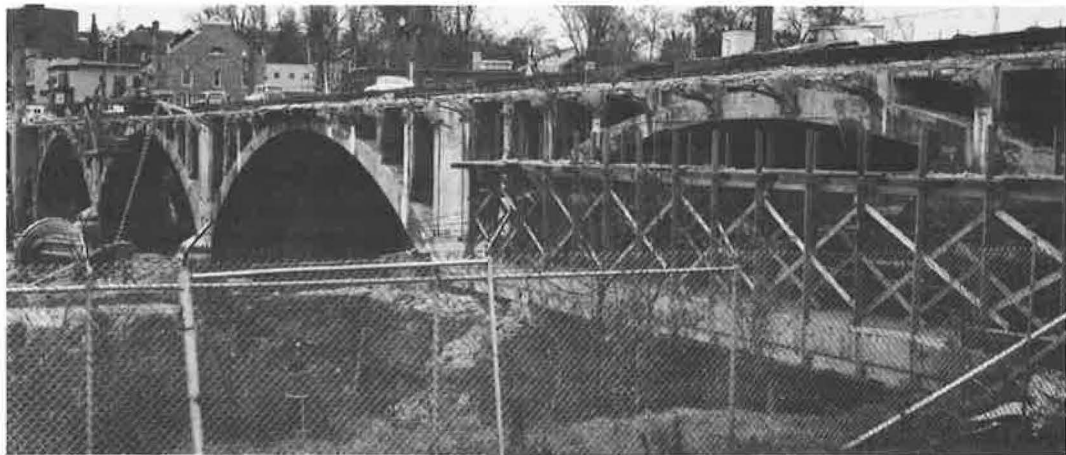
Glens Falls Bridge concrete arches after railings and wearing surfaces have been removed preparatory to repair and widening.
